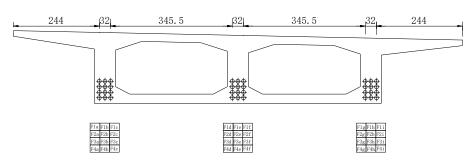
Layout drawing of prestressed steel beams (Unit: cm)
